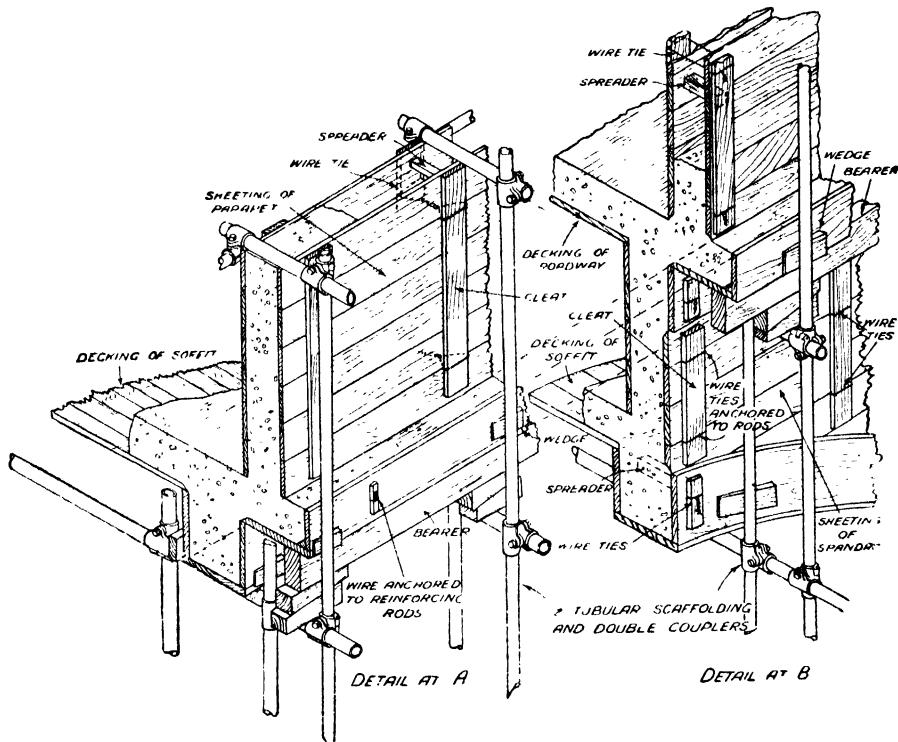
ENLARGED DETAIL OF A AND B IN FIG. 10
